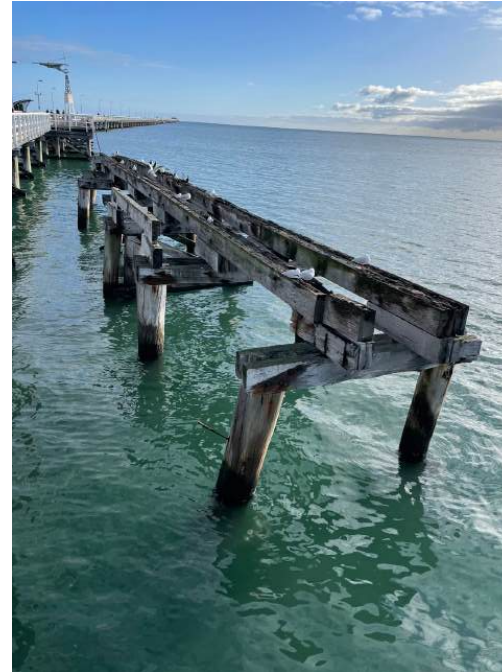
View of Interpretive Node #3 showing remaining timber jetty bents and stringer/rail beams affixed to half-caps. H+H Architects, 2022.
